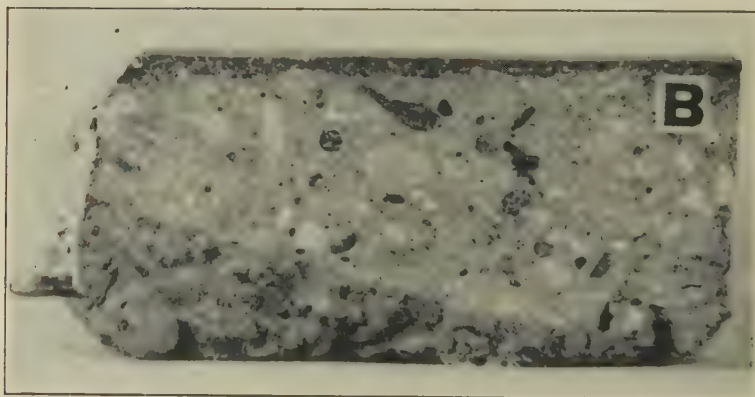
SAWED SECTION OF PANEL 8, A SLAB FINISHED WITH METALLIC HARDENER.
